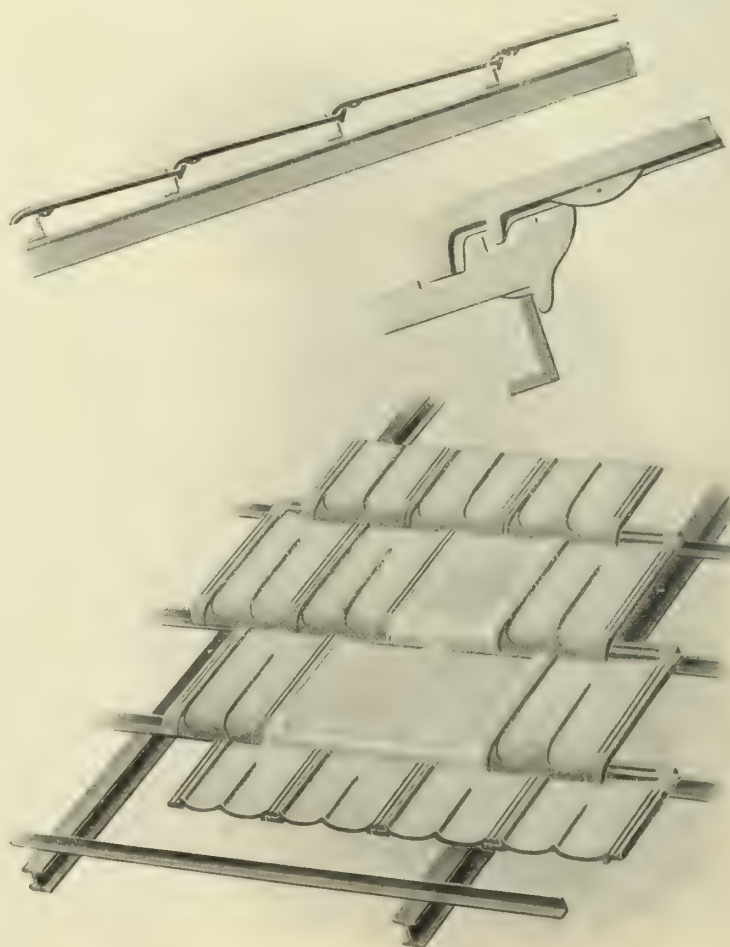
RED CLAY ROOFING TILES WITH INTERCHANGEABLE GLASS TILES
